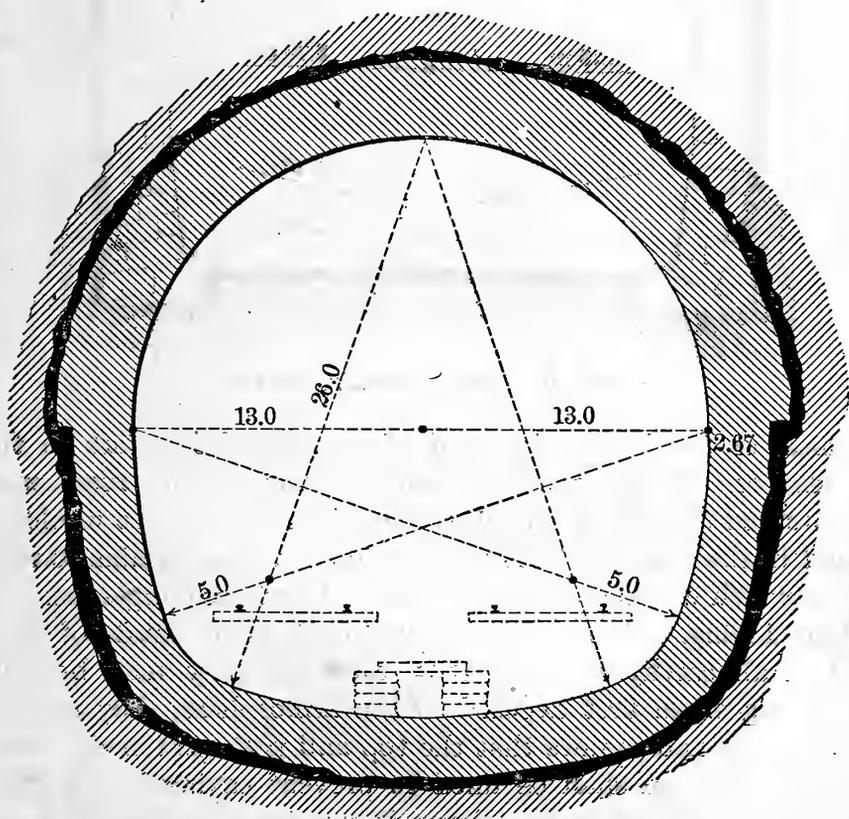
HOOSAC TUNNEL SECTION THROUGH SOFT GROUND.
